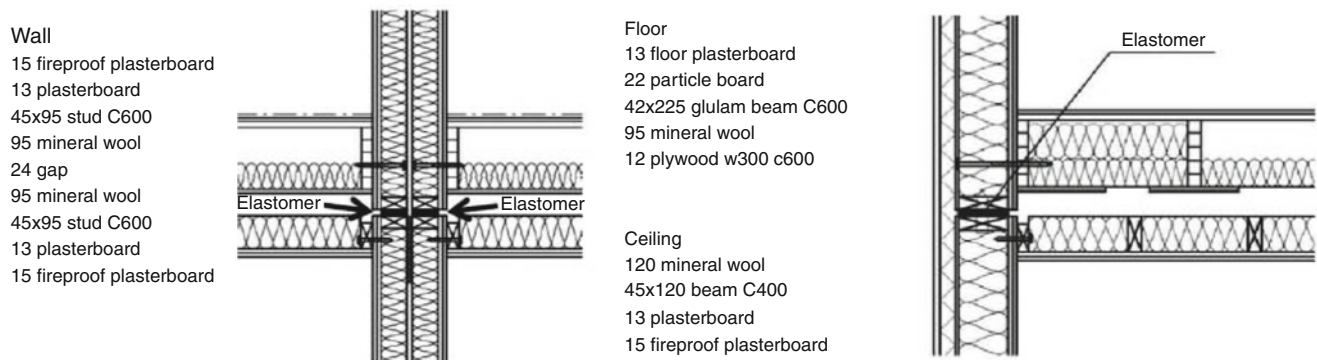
Drawings of the TVE building system, showing sections of a floor–ceiling structure and junctions with an apartment separating wall (*left*) and a façade wall (*right*)
